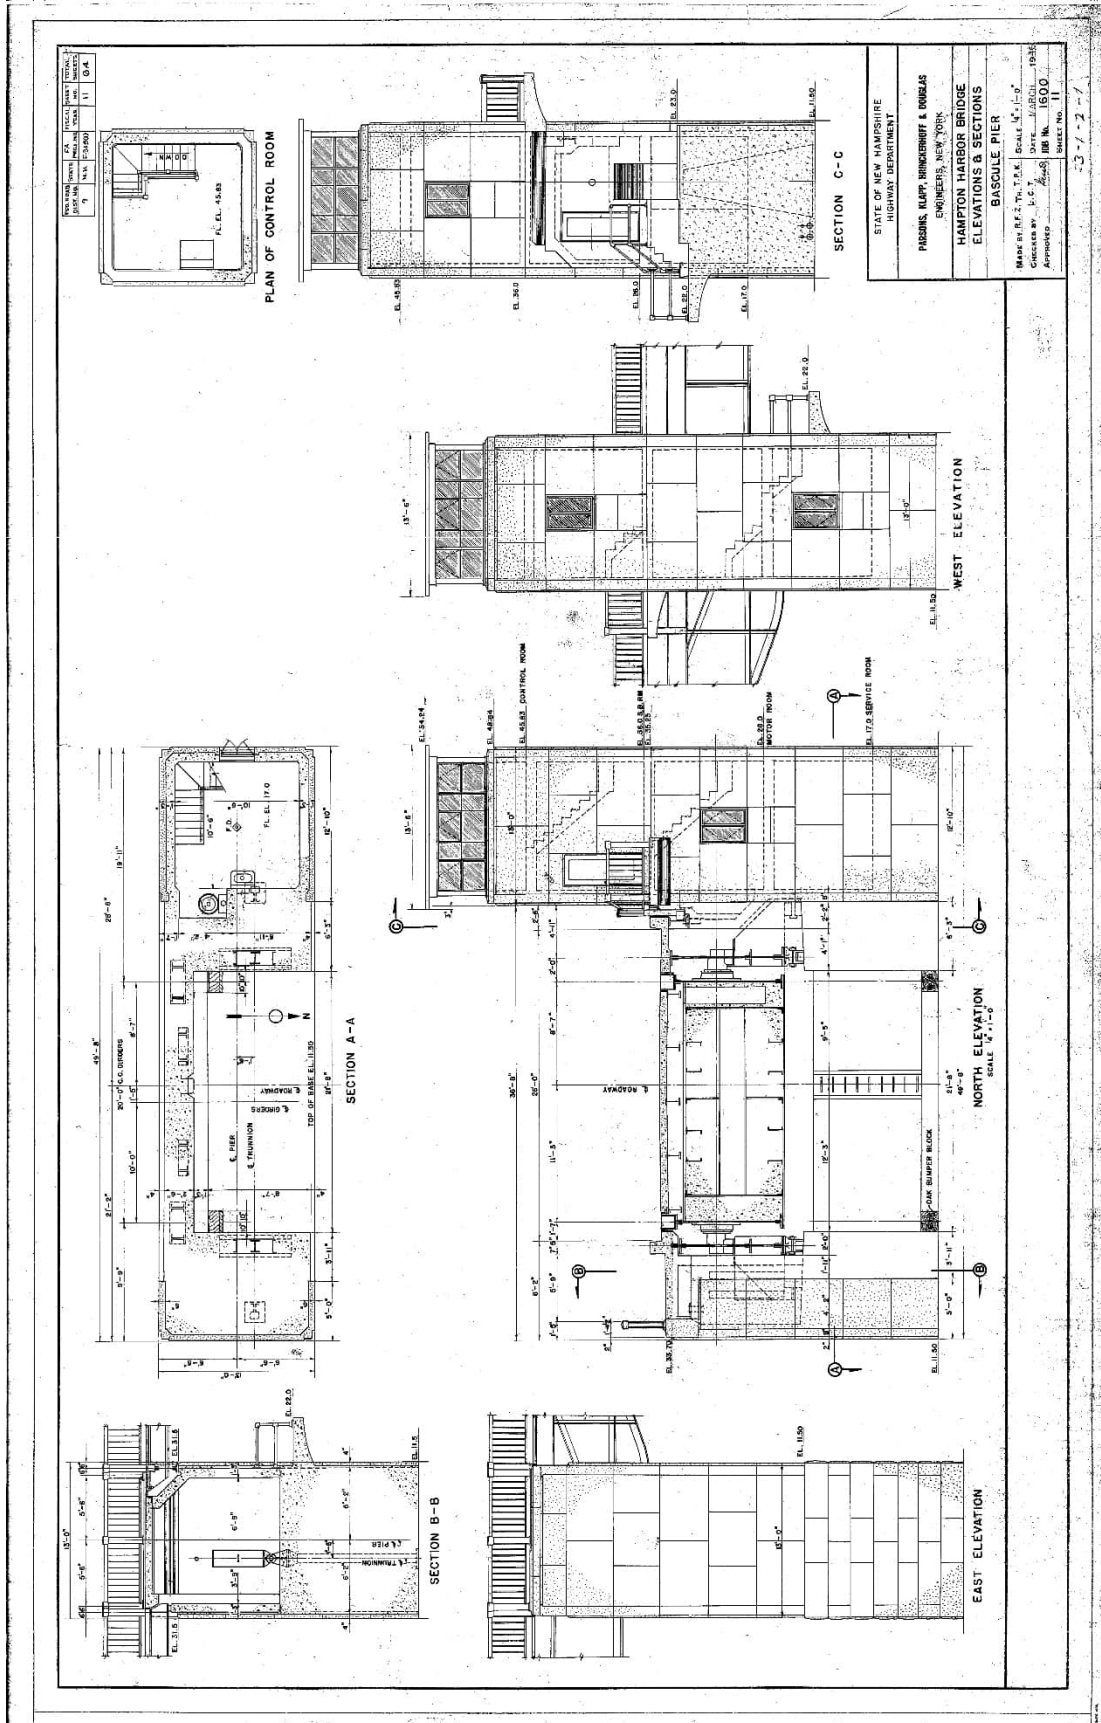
Control tower elevations and details, March 1946 (NHDOT).
